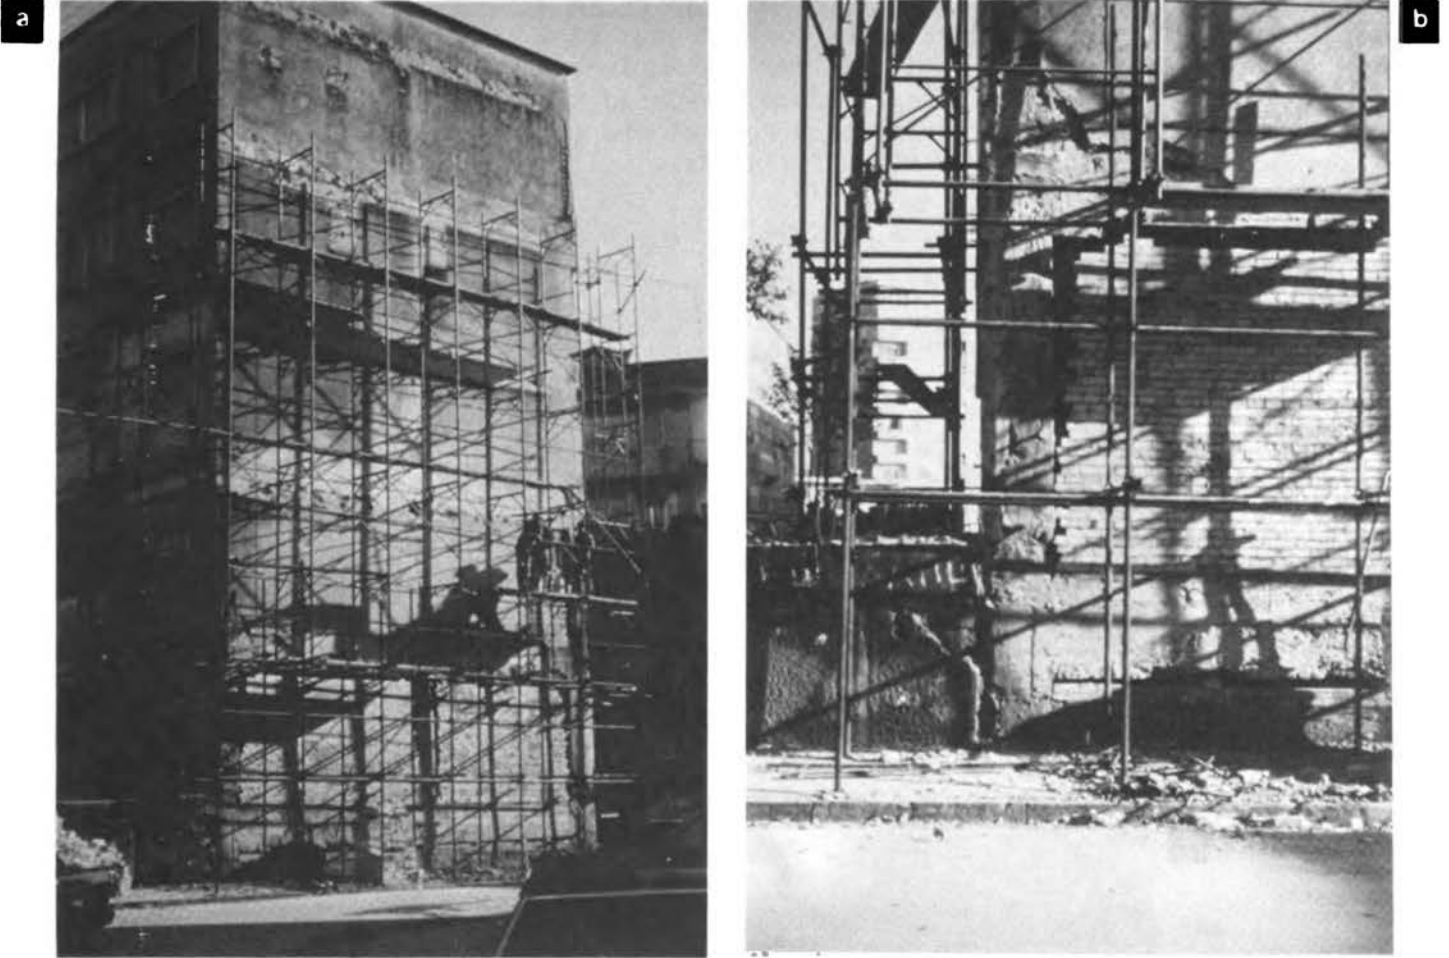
Damage to concrete structures with infill walls.
